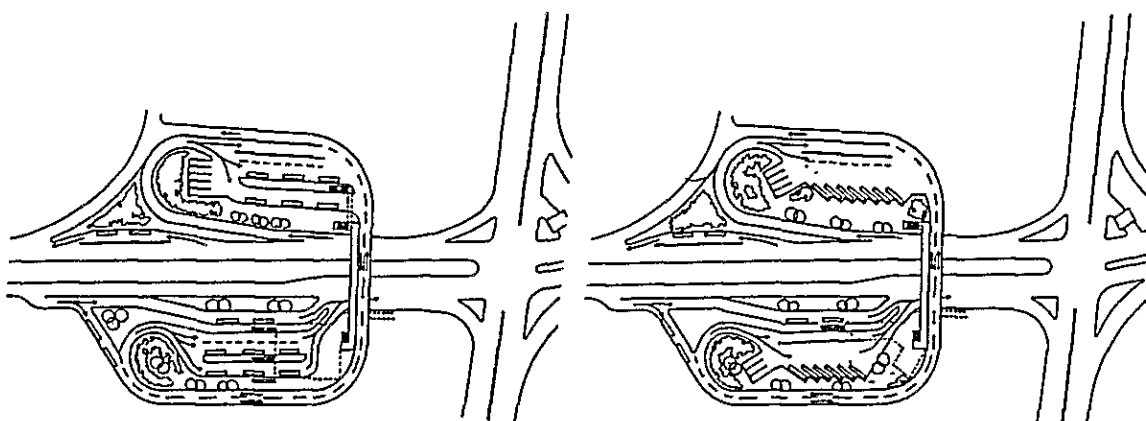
UNIVERSIDAD BUS CENTER PLAN
